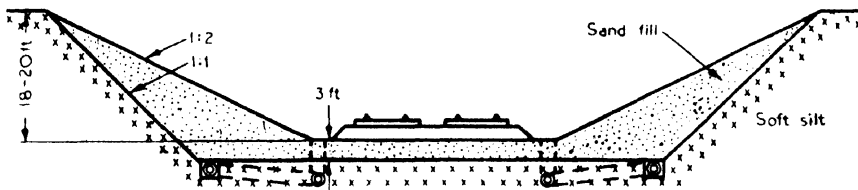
CROSS-SECTION THROUGH CUTTING AT SALZGITTER
